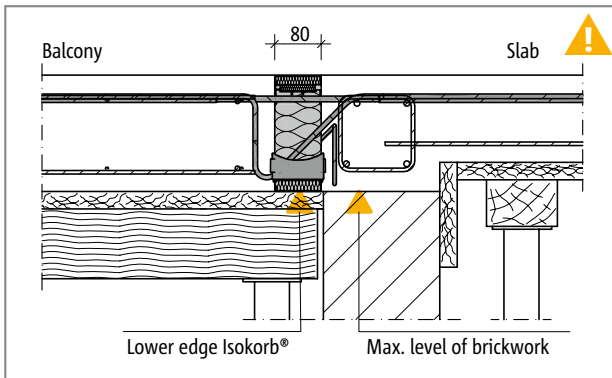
Schöck Isokorb® T type K-E, K-T: In-situ concrete construction with height offset floor on masonry wall
